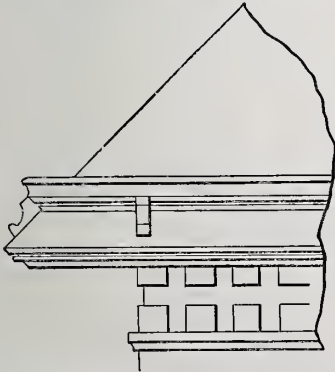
Elevation of Gutter and Cornice on Wing.—Scale, 3/8 Inch to the Foot.
